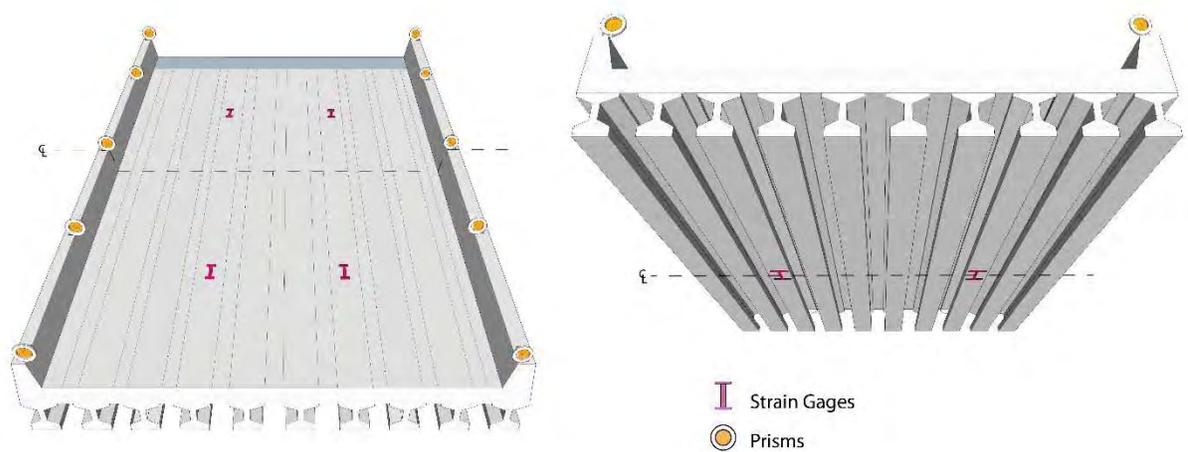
Layout of Optical Survey Prisms and Concrete Strain Gauges
